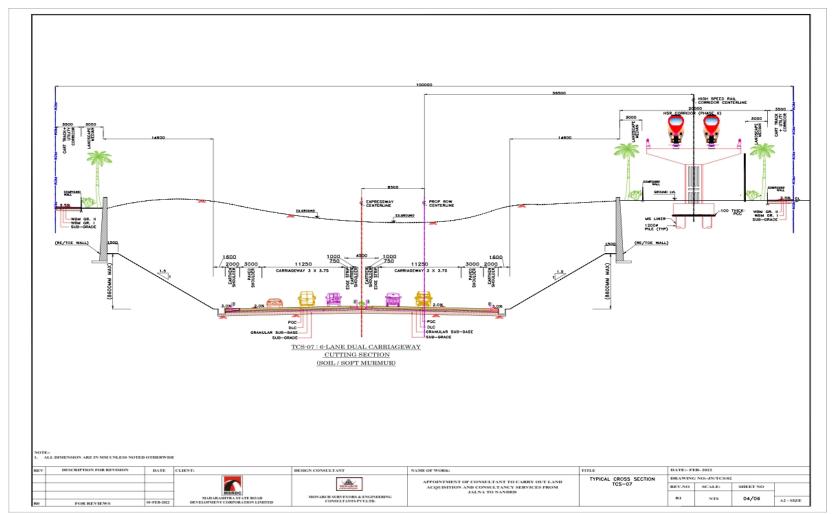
D: (Typ.) Cross Section of Proposed Alignment
